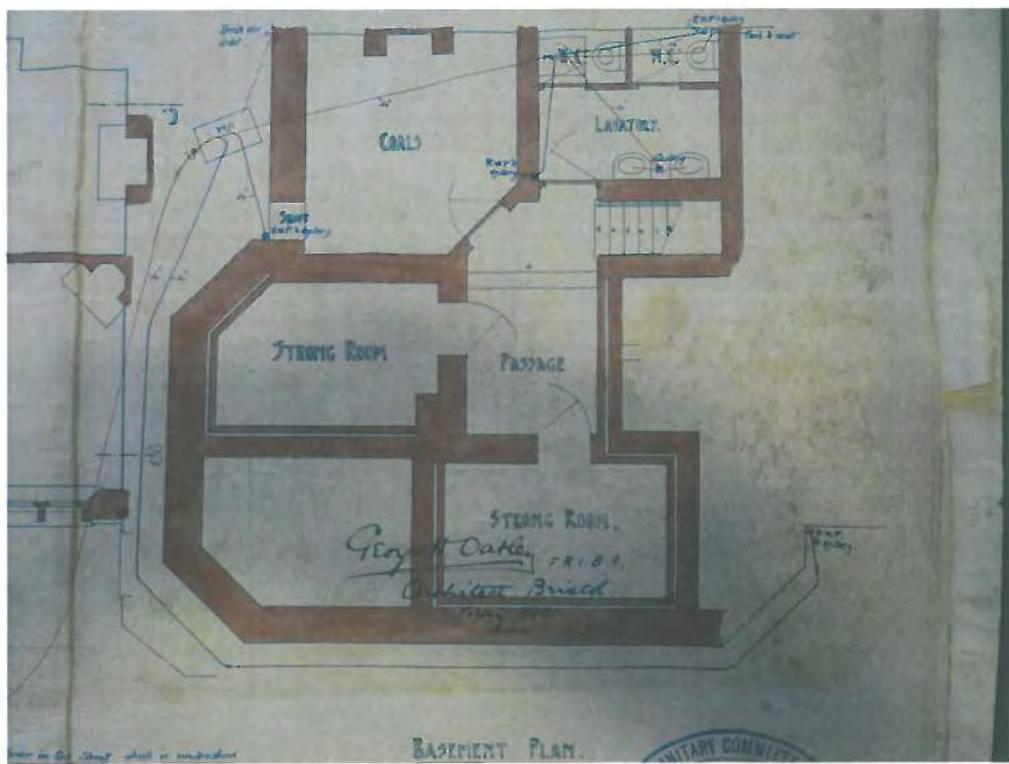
Plan of All Saints' House; basement level before extension to the right side
